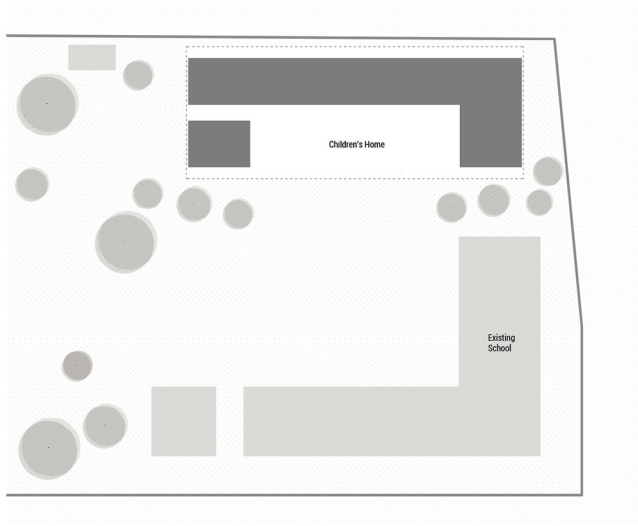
Site plan [Calandra, F., n.d.]
